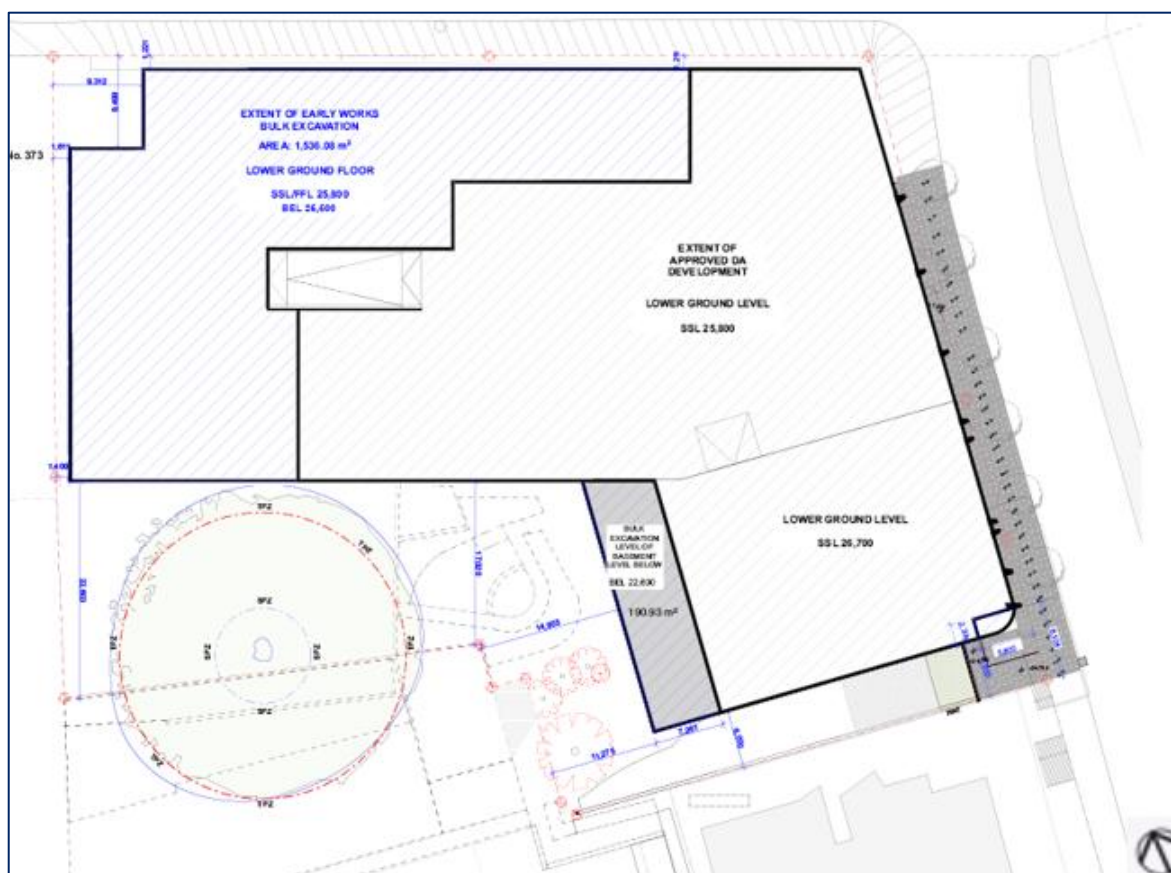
I Proposed extent of additional lower ground level excavation (blue hatched) (Source: EIS)
